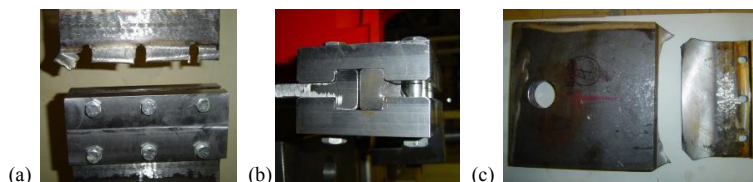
Connections of railway bridge – failures: (a) plate fracture in place of bolt holes; (b) plate fracture in transition to head; (c) weld fracture.
